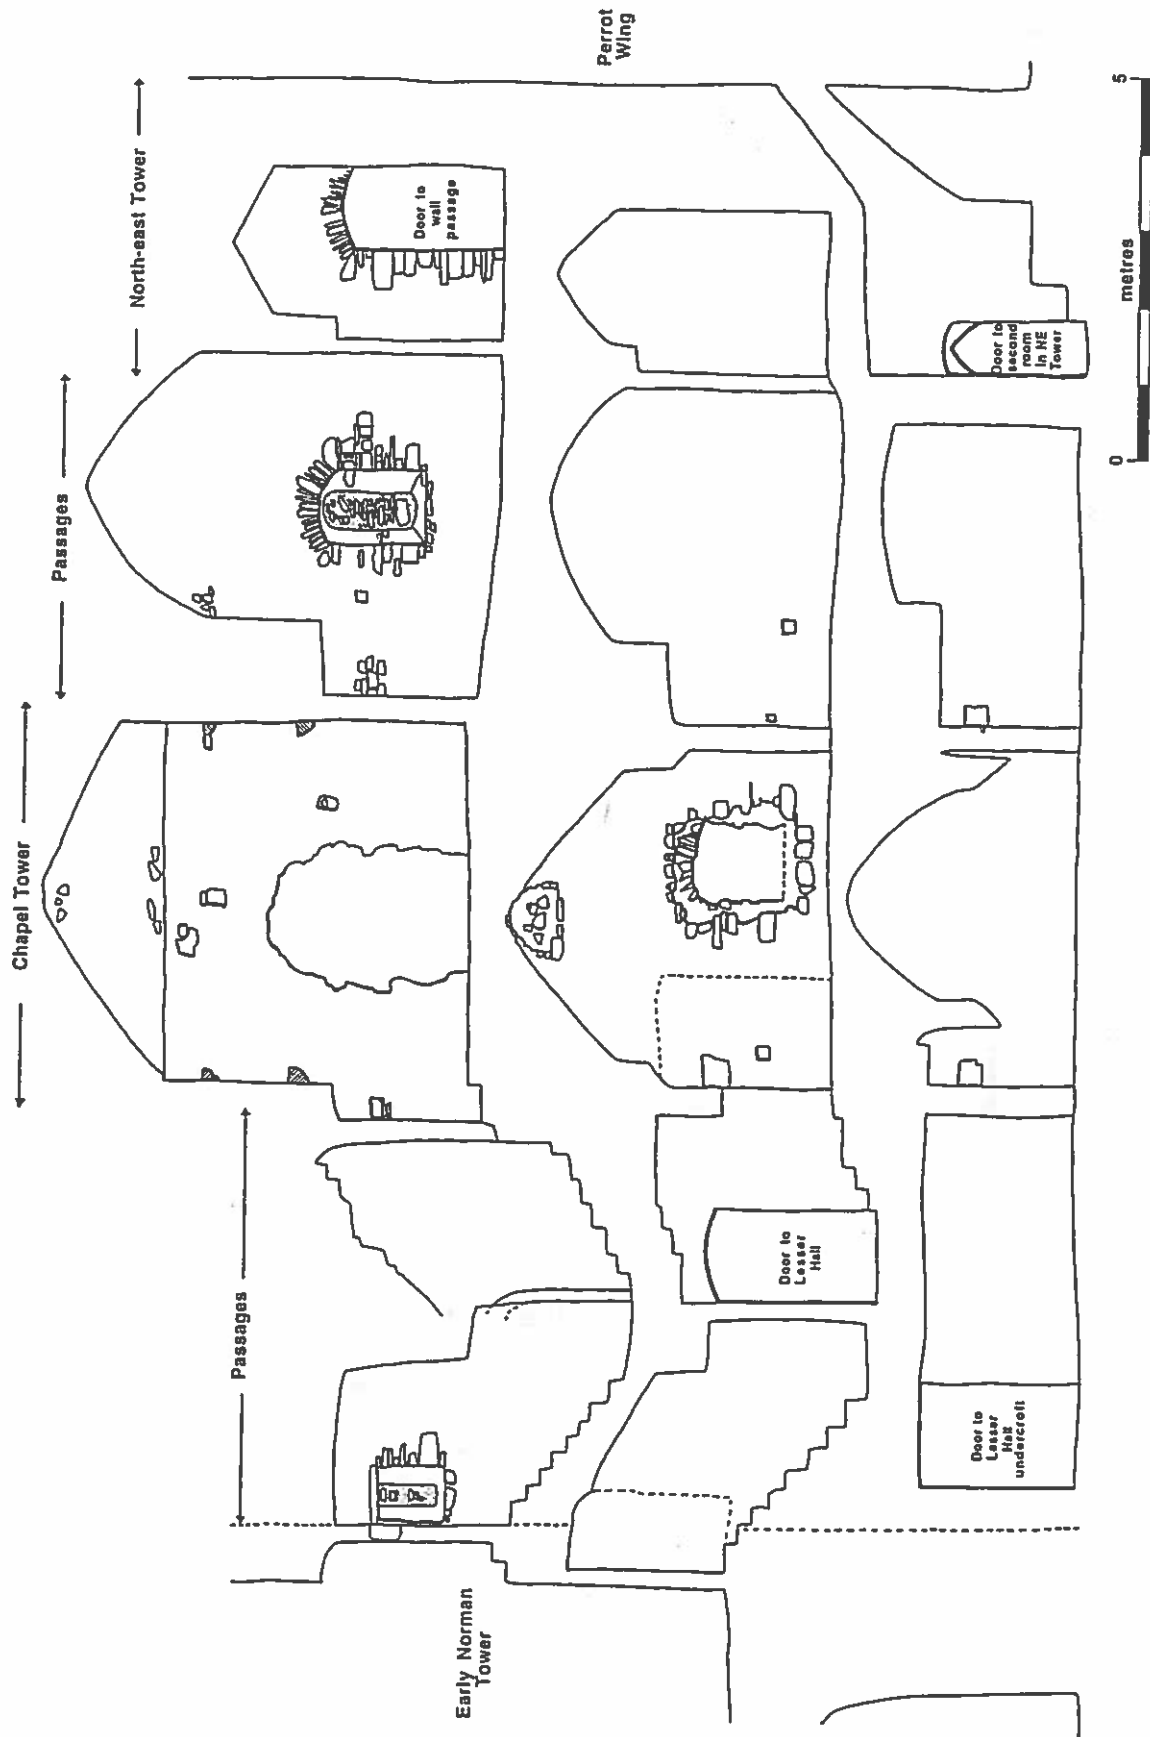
Elevation of the inner face of the west wall of the inter-mural passage on the east front of the Inner Ward (N. Evans)
